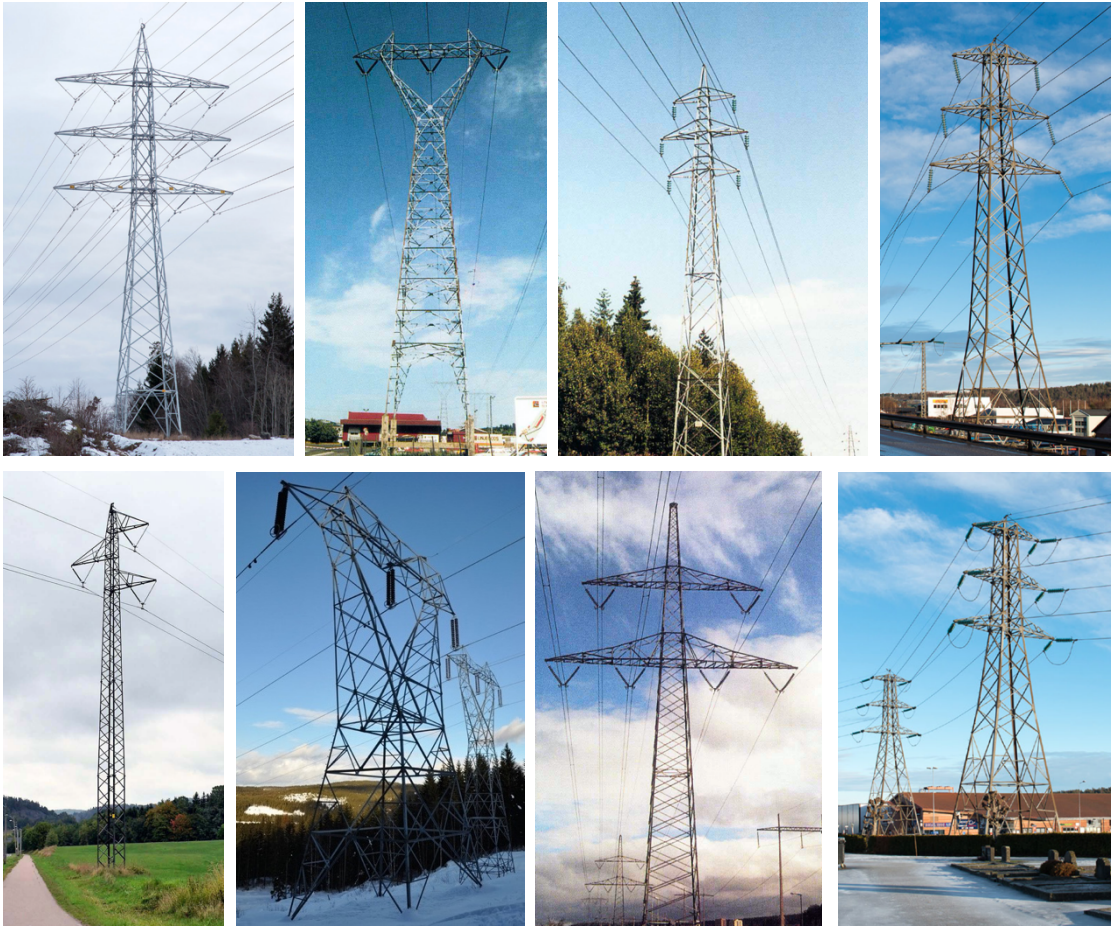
LATTICE STEEL TOWERS ACROSS NORWAY [59, 60]
